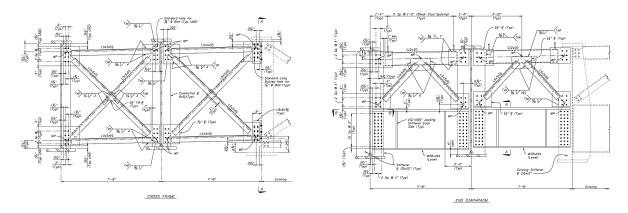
Cross-frame details of the bridge SR-589 over Waters Avenue
